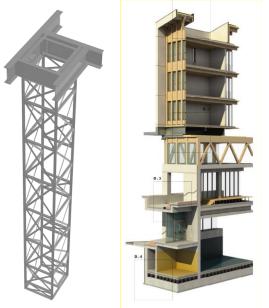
a) Detail of the steel trussed structure of the elevation shaft for the stories below the isolation level rigidly connected to the stiff steel floor; b) Exploded detail of the structures, reinforced concrete walls and floors below the ground level, the first story made of steel and glulam columns and bracings, the double timber and steel floor at the isolation level and the timber structure of the four stories above made of timber frames and CLT walls.
